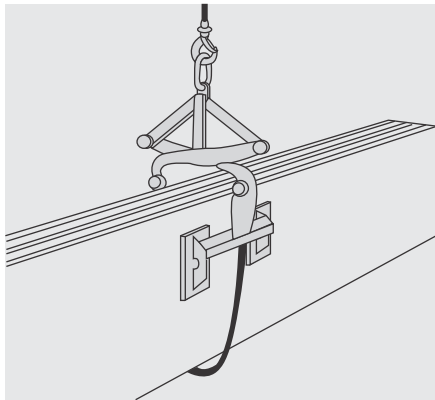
Lifting gear (Hebel® horizontal wall panels).
